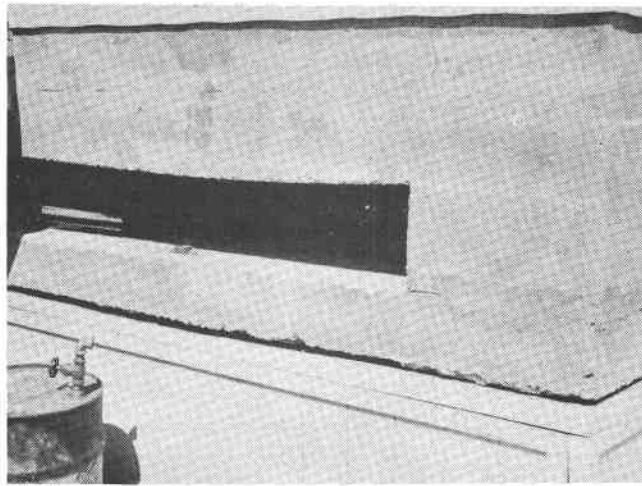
Double or "false" concrete floor used to minimize heat flow into ground.
